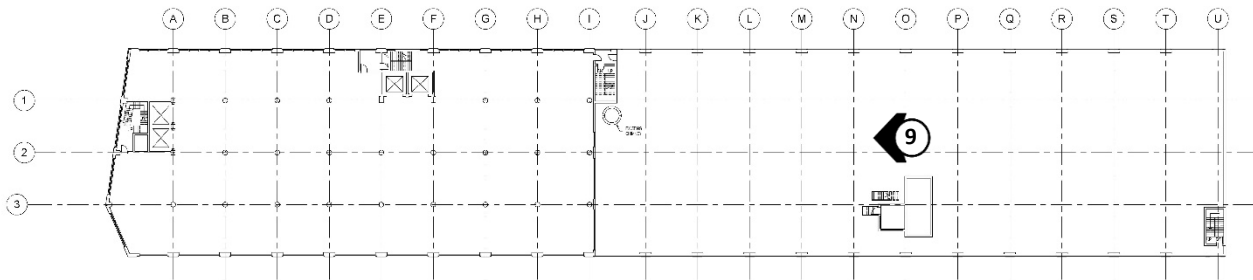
Existing Floor Plans and Photograph Keys – Floors 3S and 2N. 4, and 5
